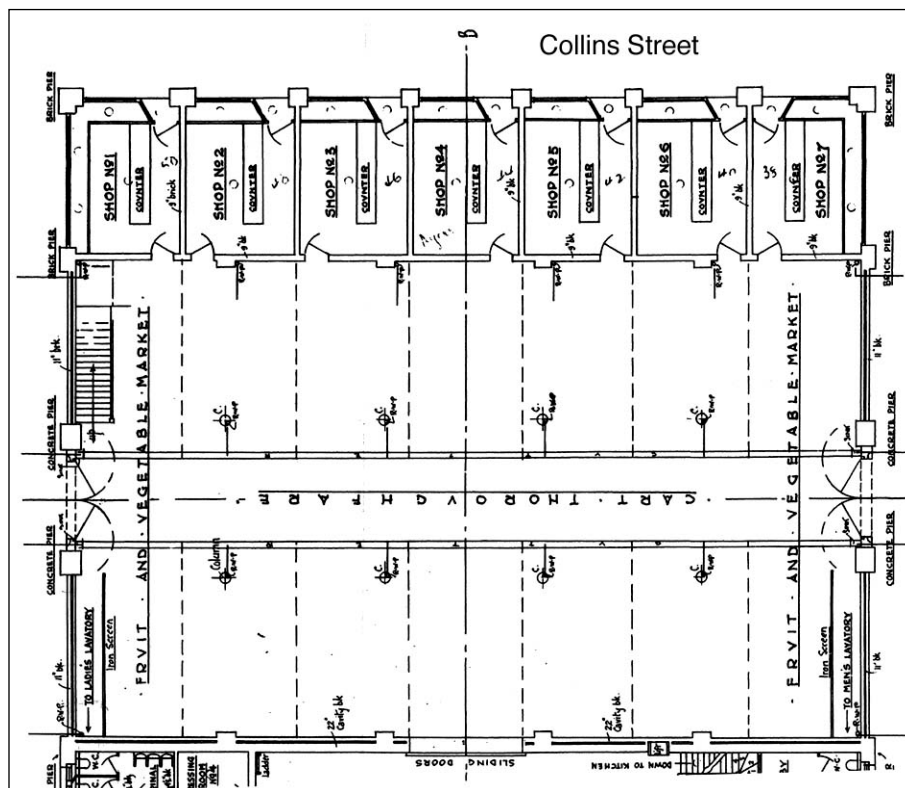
Detail of 1914 plan showing layout of market area and Collins Street shops (HCC Drawing A7²).
